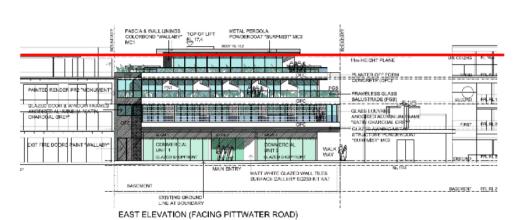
Plan (east elevation) extract showing extent of 11 metre building height breach
